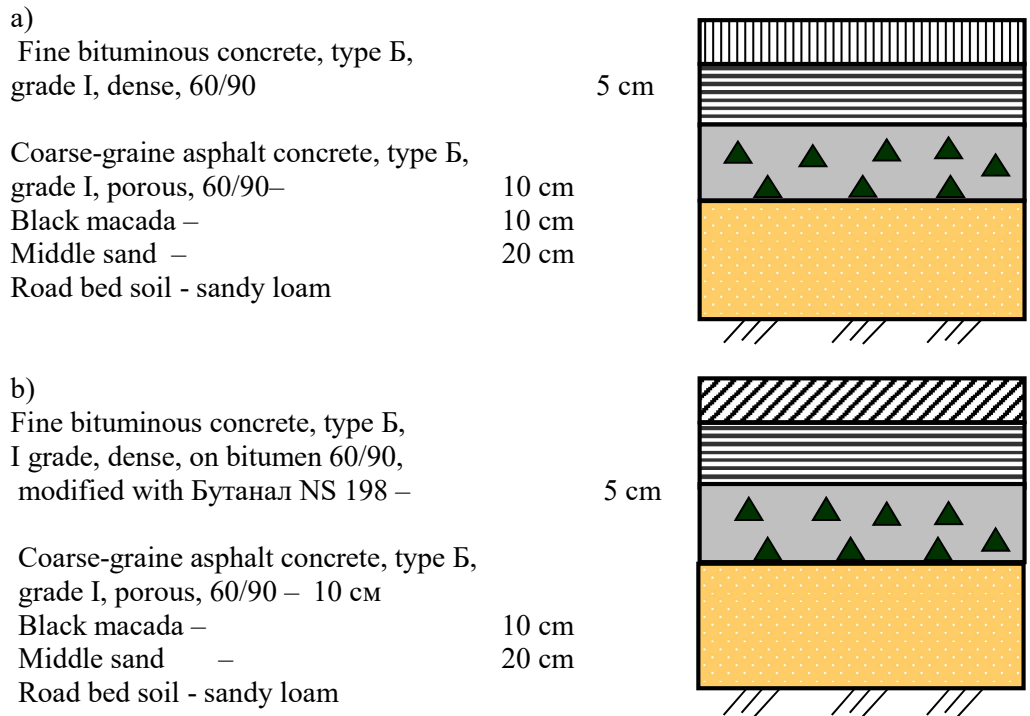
Paving structure : a) using asphalt concrete; b) using PAC
